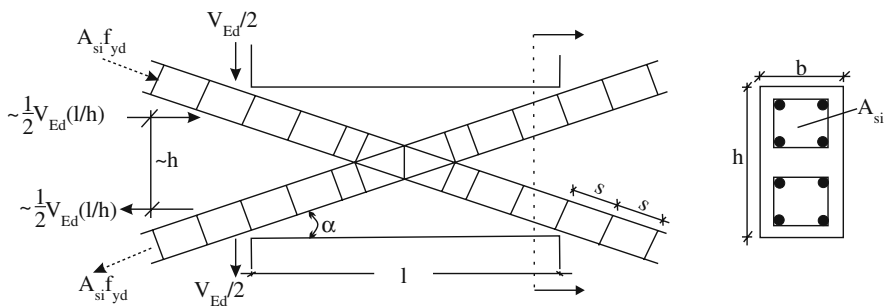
Diagonally reinforced coupling beam (CEN 2004a)
